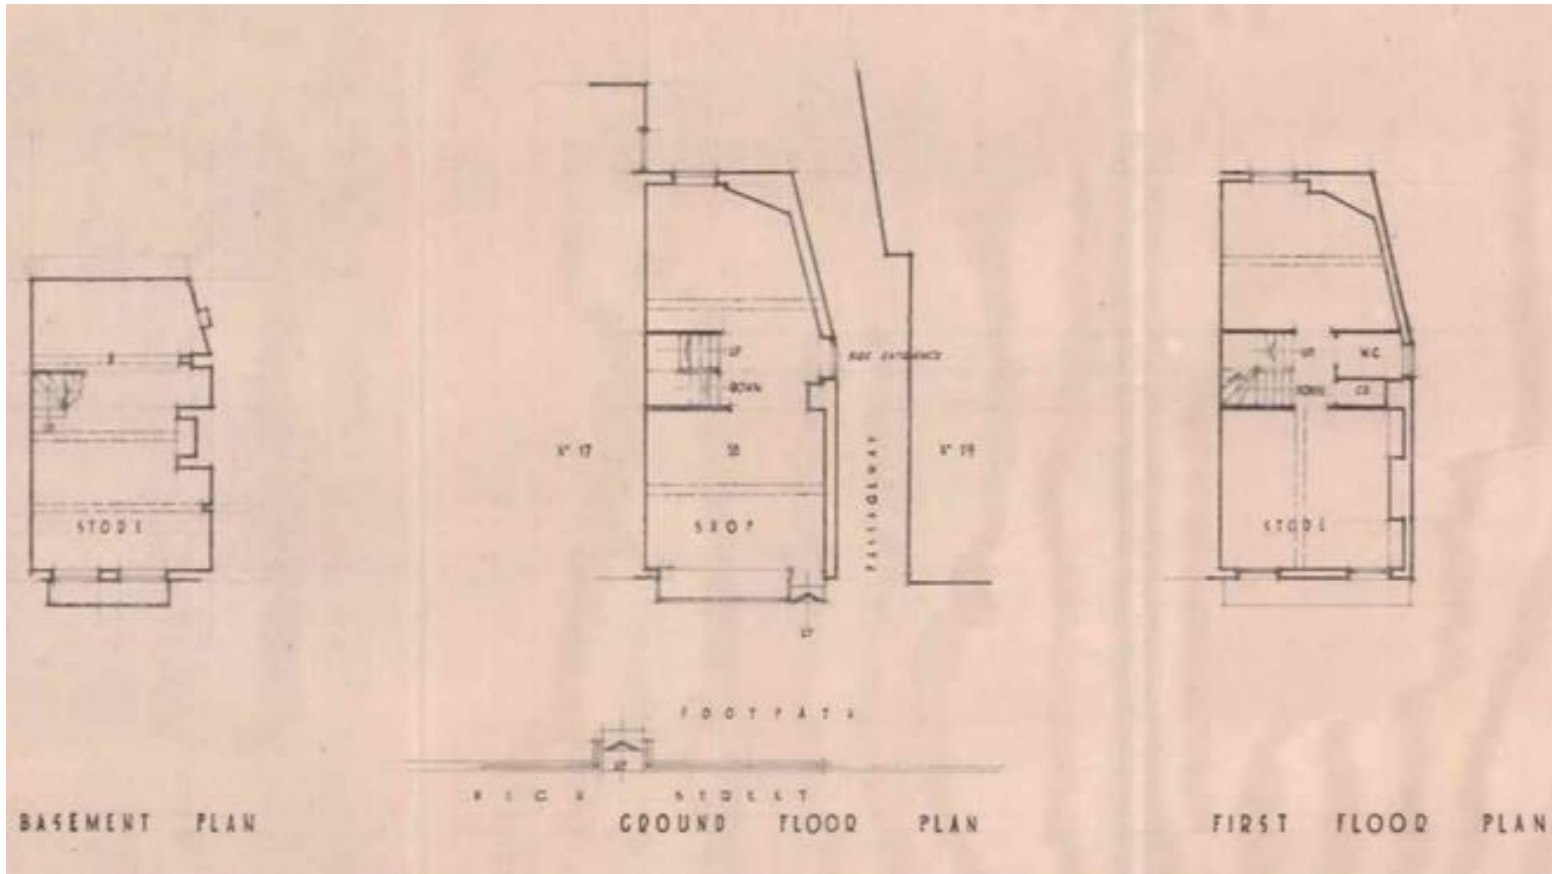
Existing Floor Plans of no. 18 High Street, 1982.
